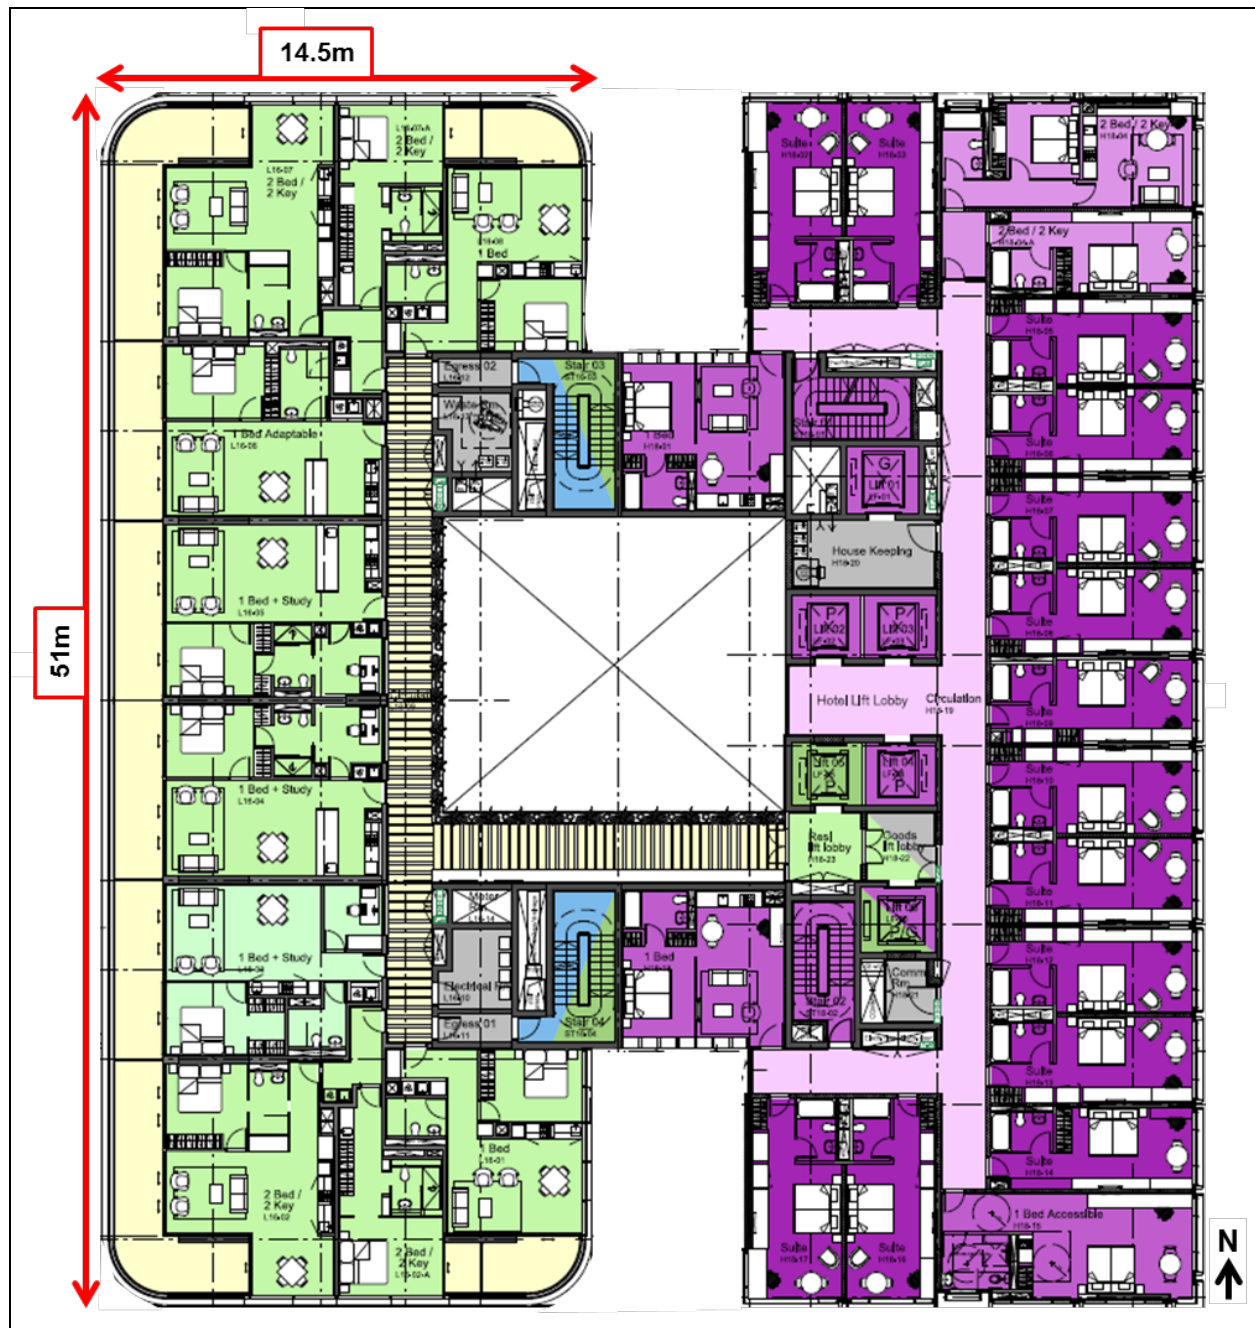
Typical residential floor layout and residential building depth (Base source: applicant's RtS)
